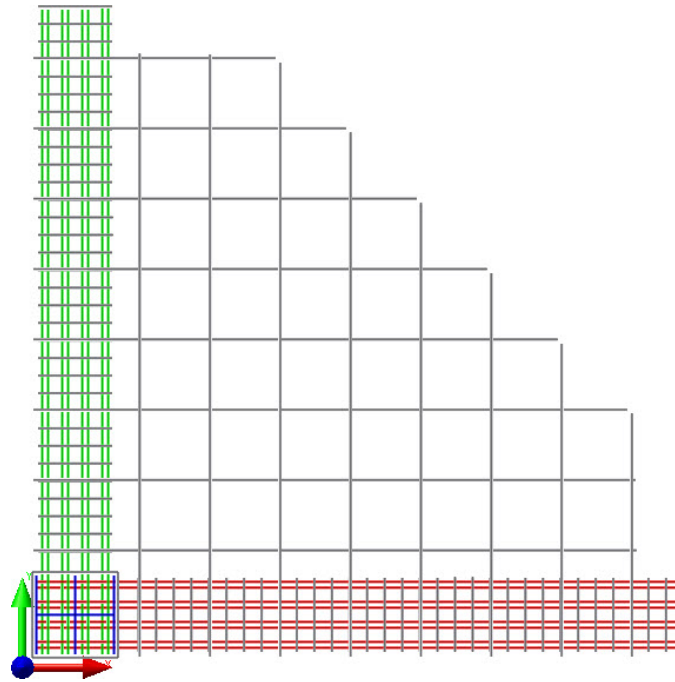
Reinforcing Bar Mesh for Park Specimen – Elevation Views
